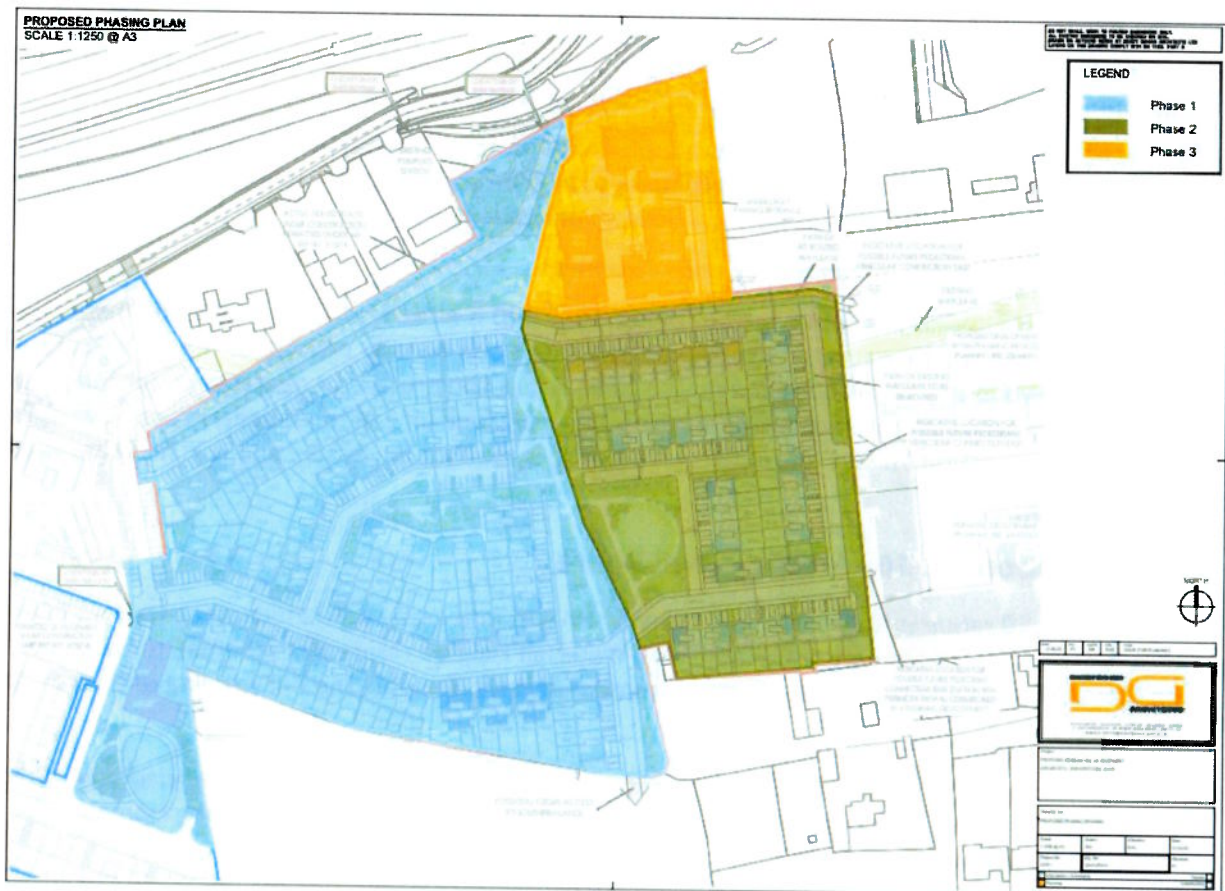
Phasing Plan by Deady Gahan Architects (Dwg Ref. 23161/P/011)
